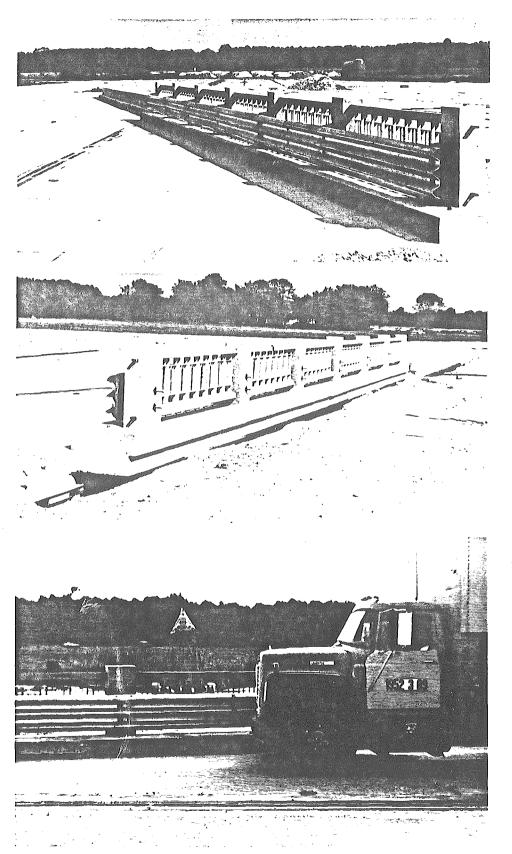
Pretest photographs of bridge rail system, test 1952-3-89.
